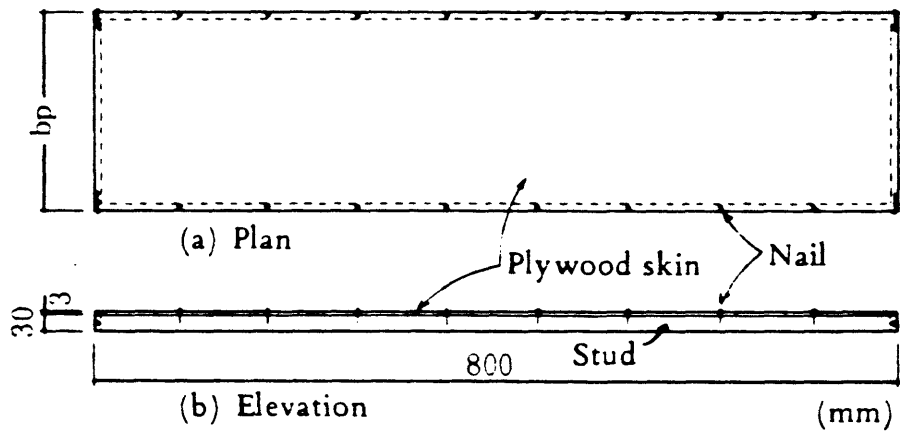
1 3 Construction detail of tested stressed-skin panel.
